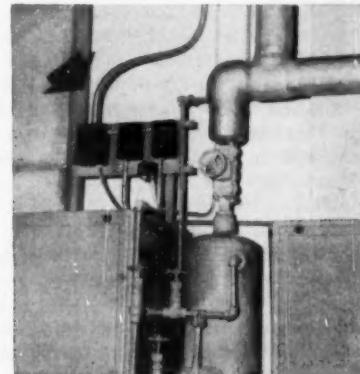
Refrigeration motor controllers and thermostatic controls (arrow) are mounted on a plate supported by channel iron pieces close to the wall at one end of the chill room. Refrigeration equipment and piping are shown here. Two blower units (right and left) are powered at 480 volts.
